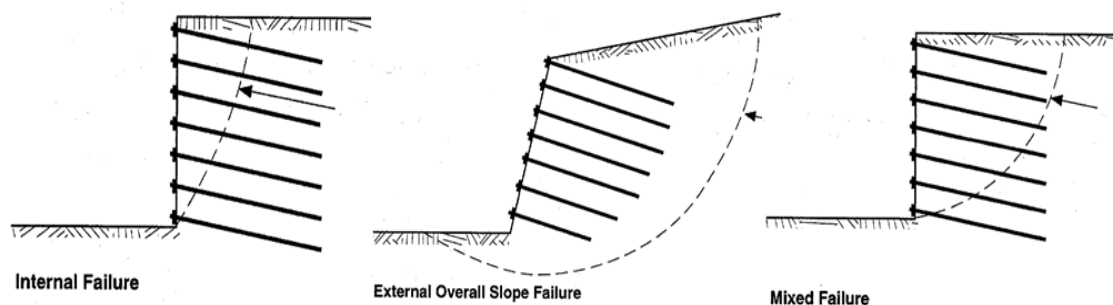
Failure modes in soil nail walls (Modified after Byrne et al., 1998)
